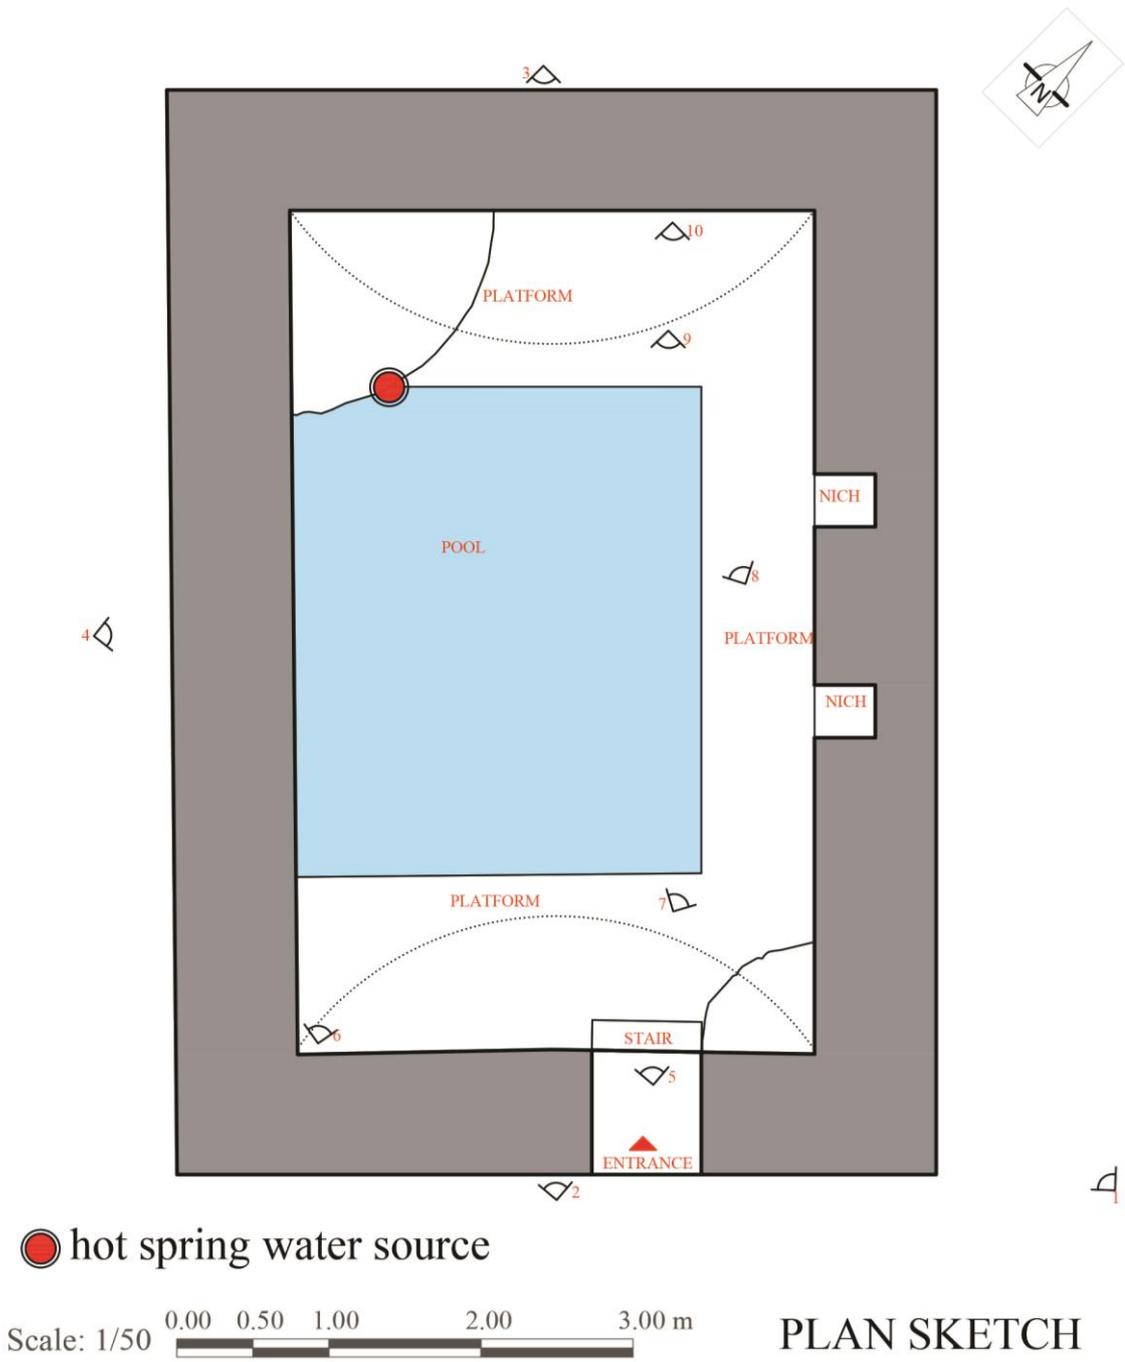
Ilksu Thermal Spring Bath, Plan Sketch
